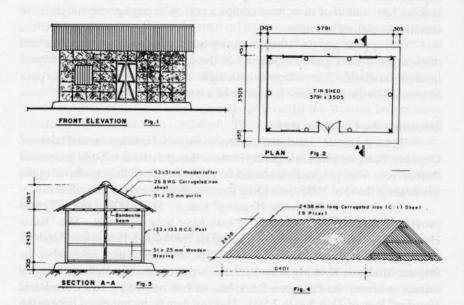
Plan, Elevation, Section and other details of Grameen Bank's Basic house
